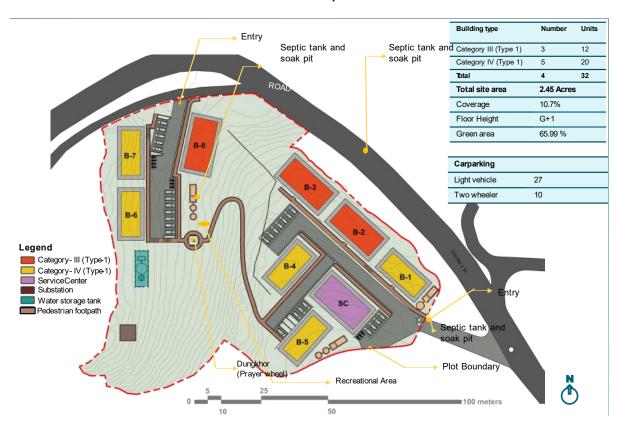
Layout plan of Existing and Proposed Works (Nganglam Housing Development Site)
